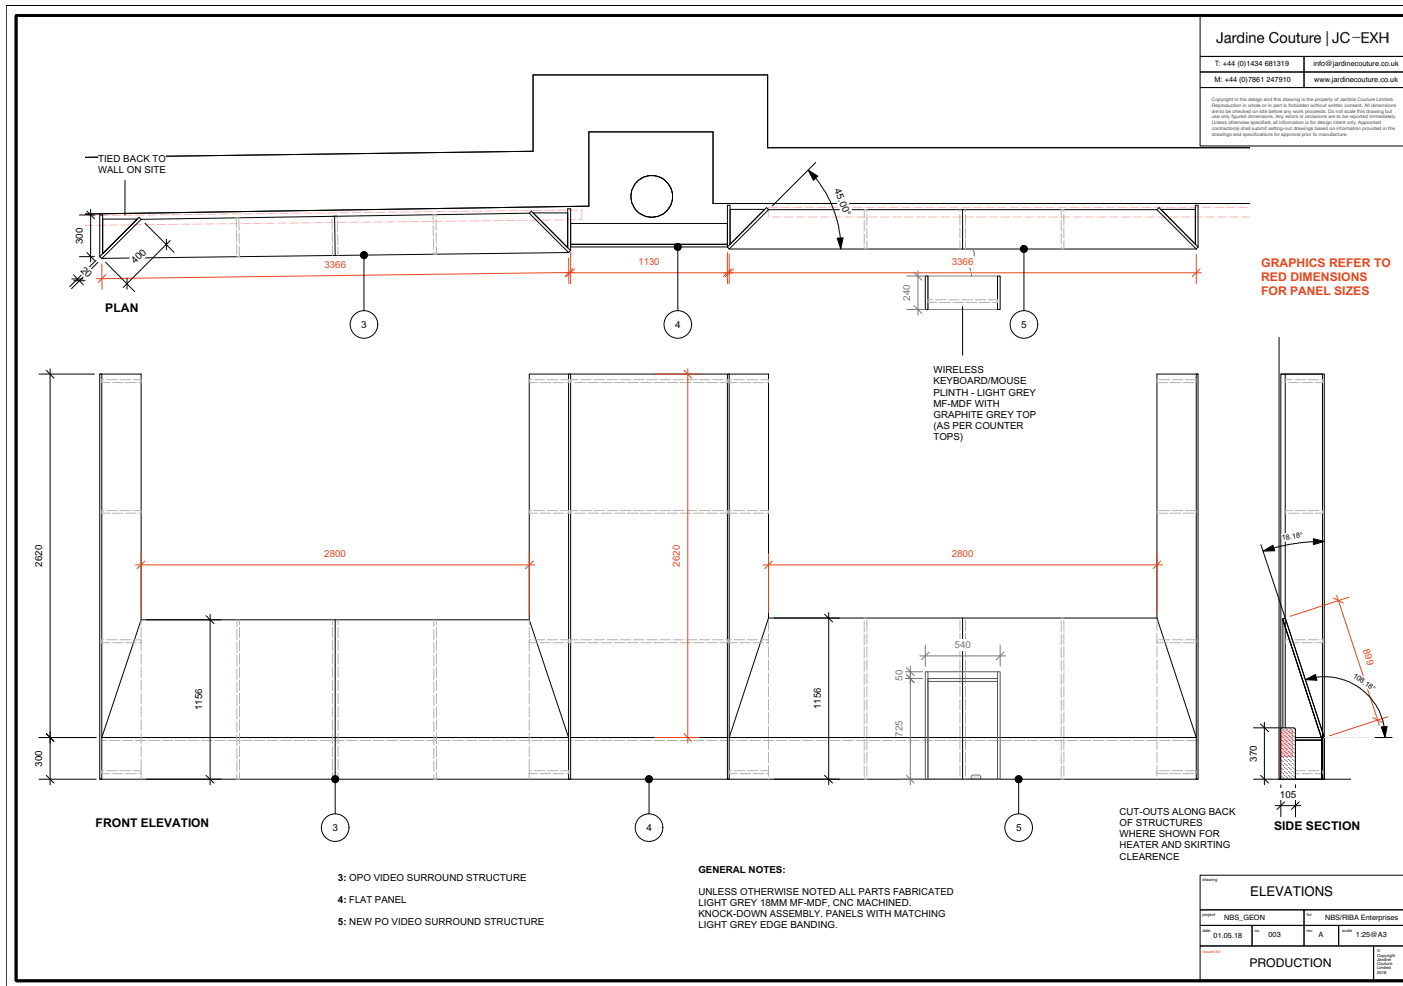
Sample drawing from detail drawing pack for Future Buildings exhibition
